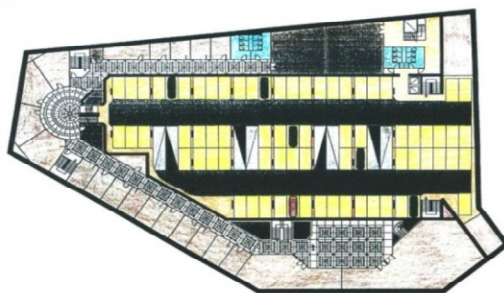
Basement floor plan (-2) of Second Underground Garage under Tahrir Square.
